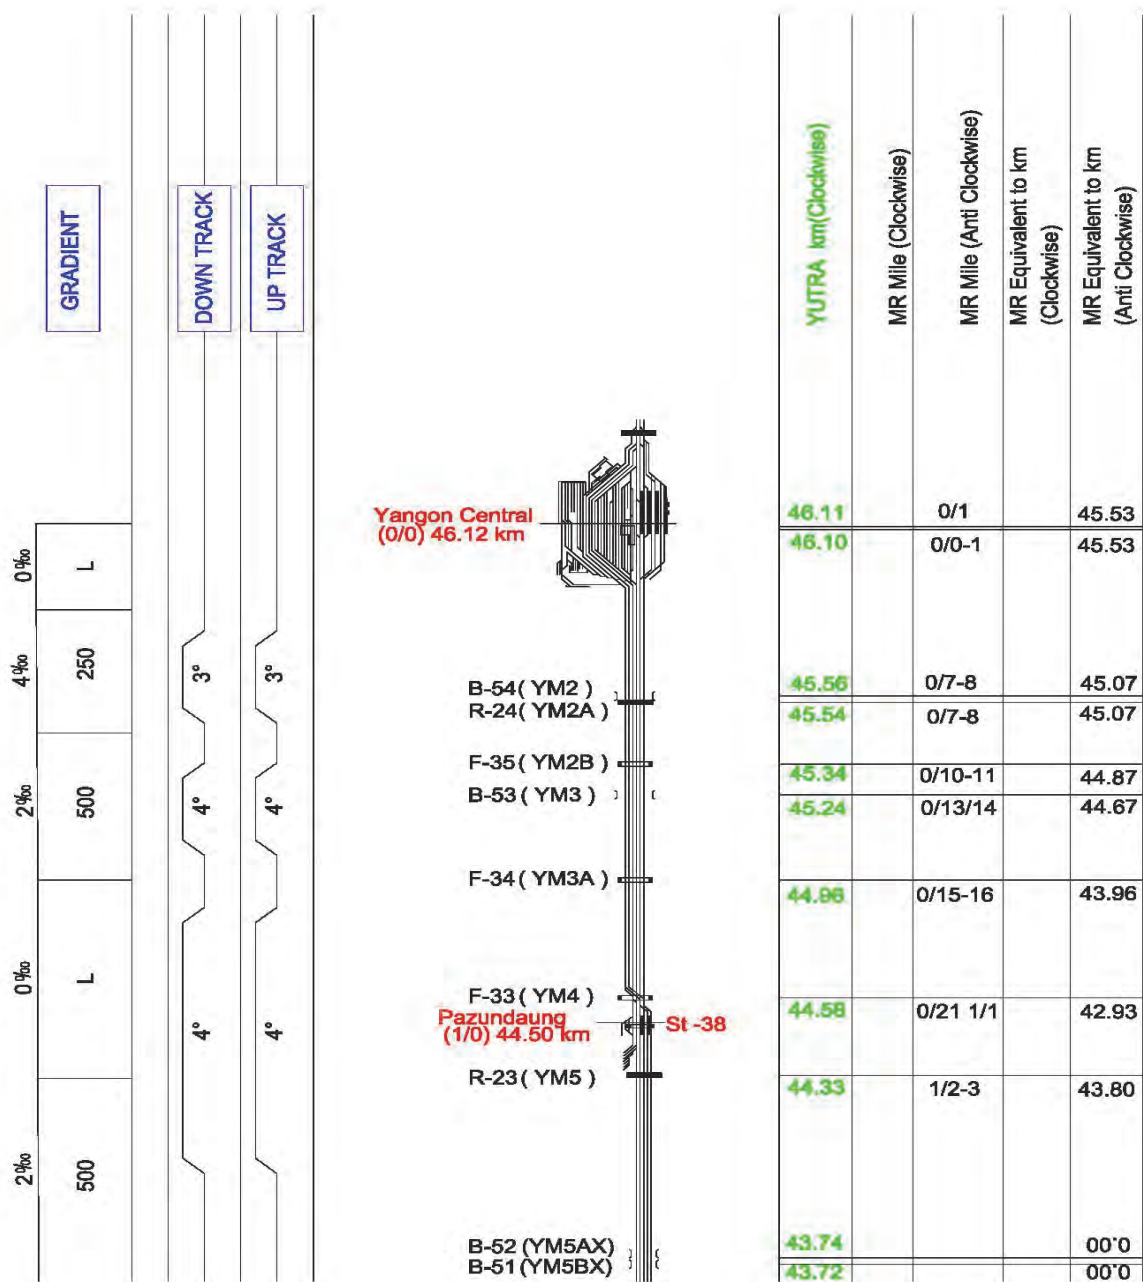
Schematic Sketch on Existing Yangon Circular Railway (9/9)
